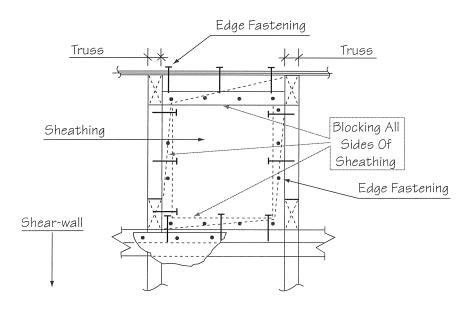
DETAIL B ~ ATTIC SHEAR-WALL EXTENSION IN CONVENTONAL ROOF FRAMING
